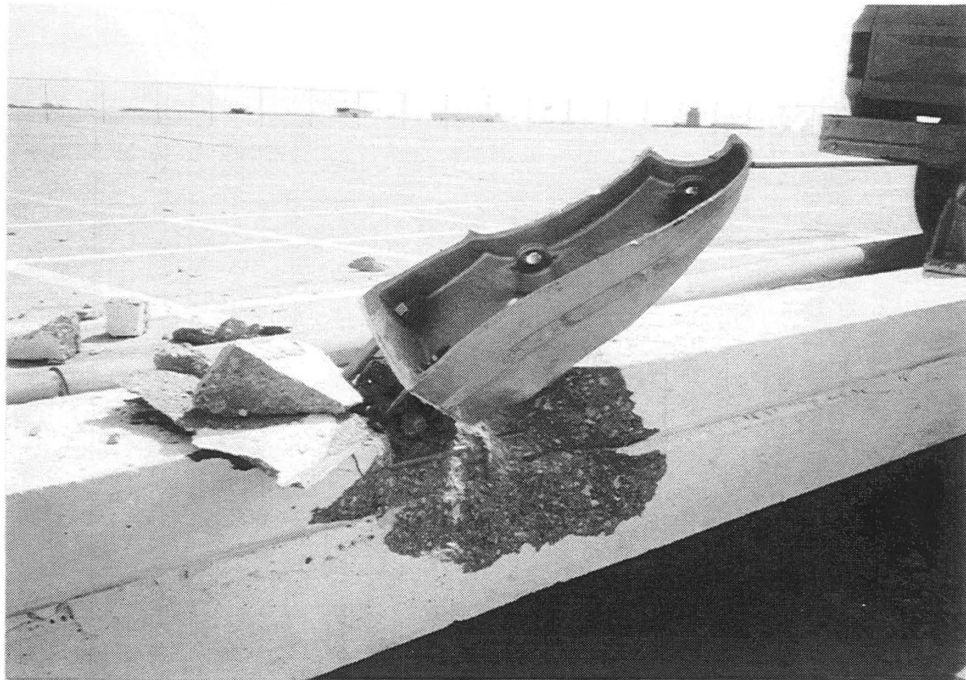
Bridge Rail Damage, Test FPAR-2.
